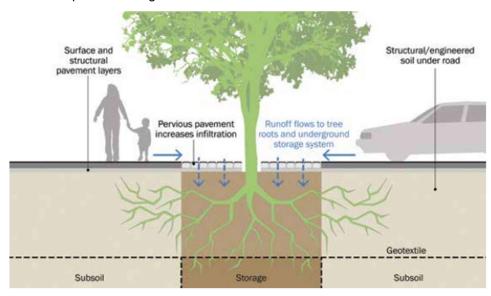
Typical Tree Pit Detail (CIRIA SuDS Manual C753)
